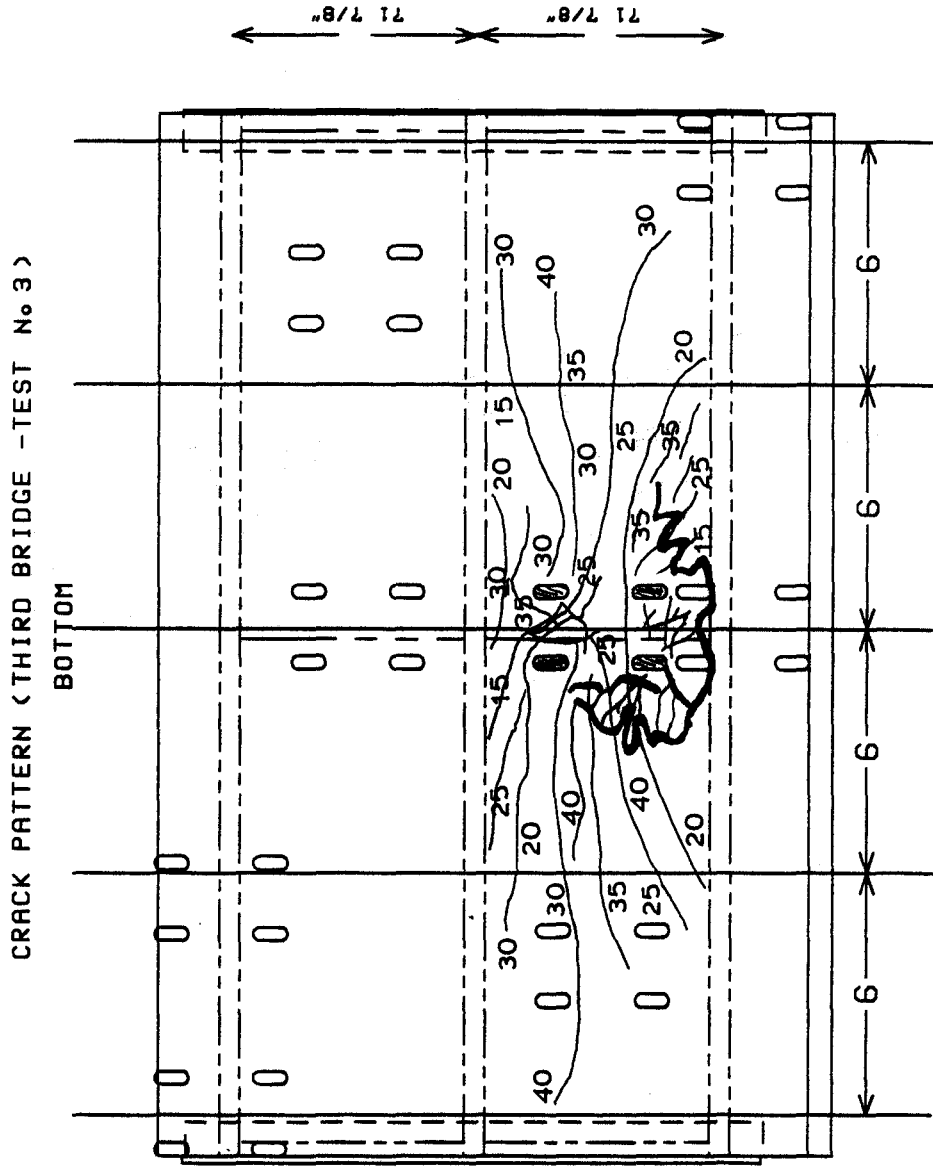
Bottom Cracking Pattern (Third Bridge - Test No. 3)
